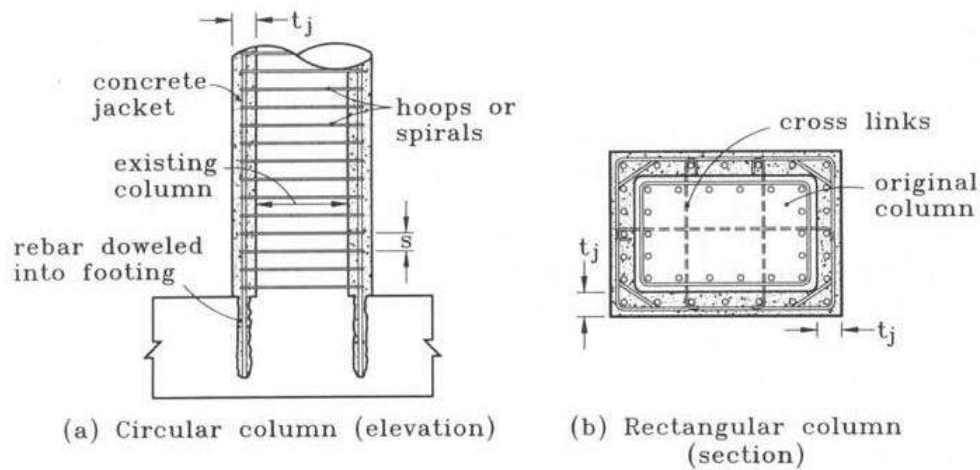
Typical Layout of Concrete Jacketing Retrofit (Priestley et al. 1996)
